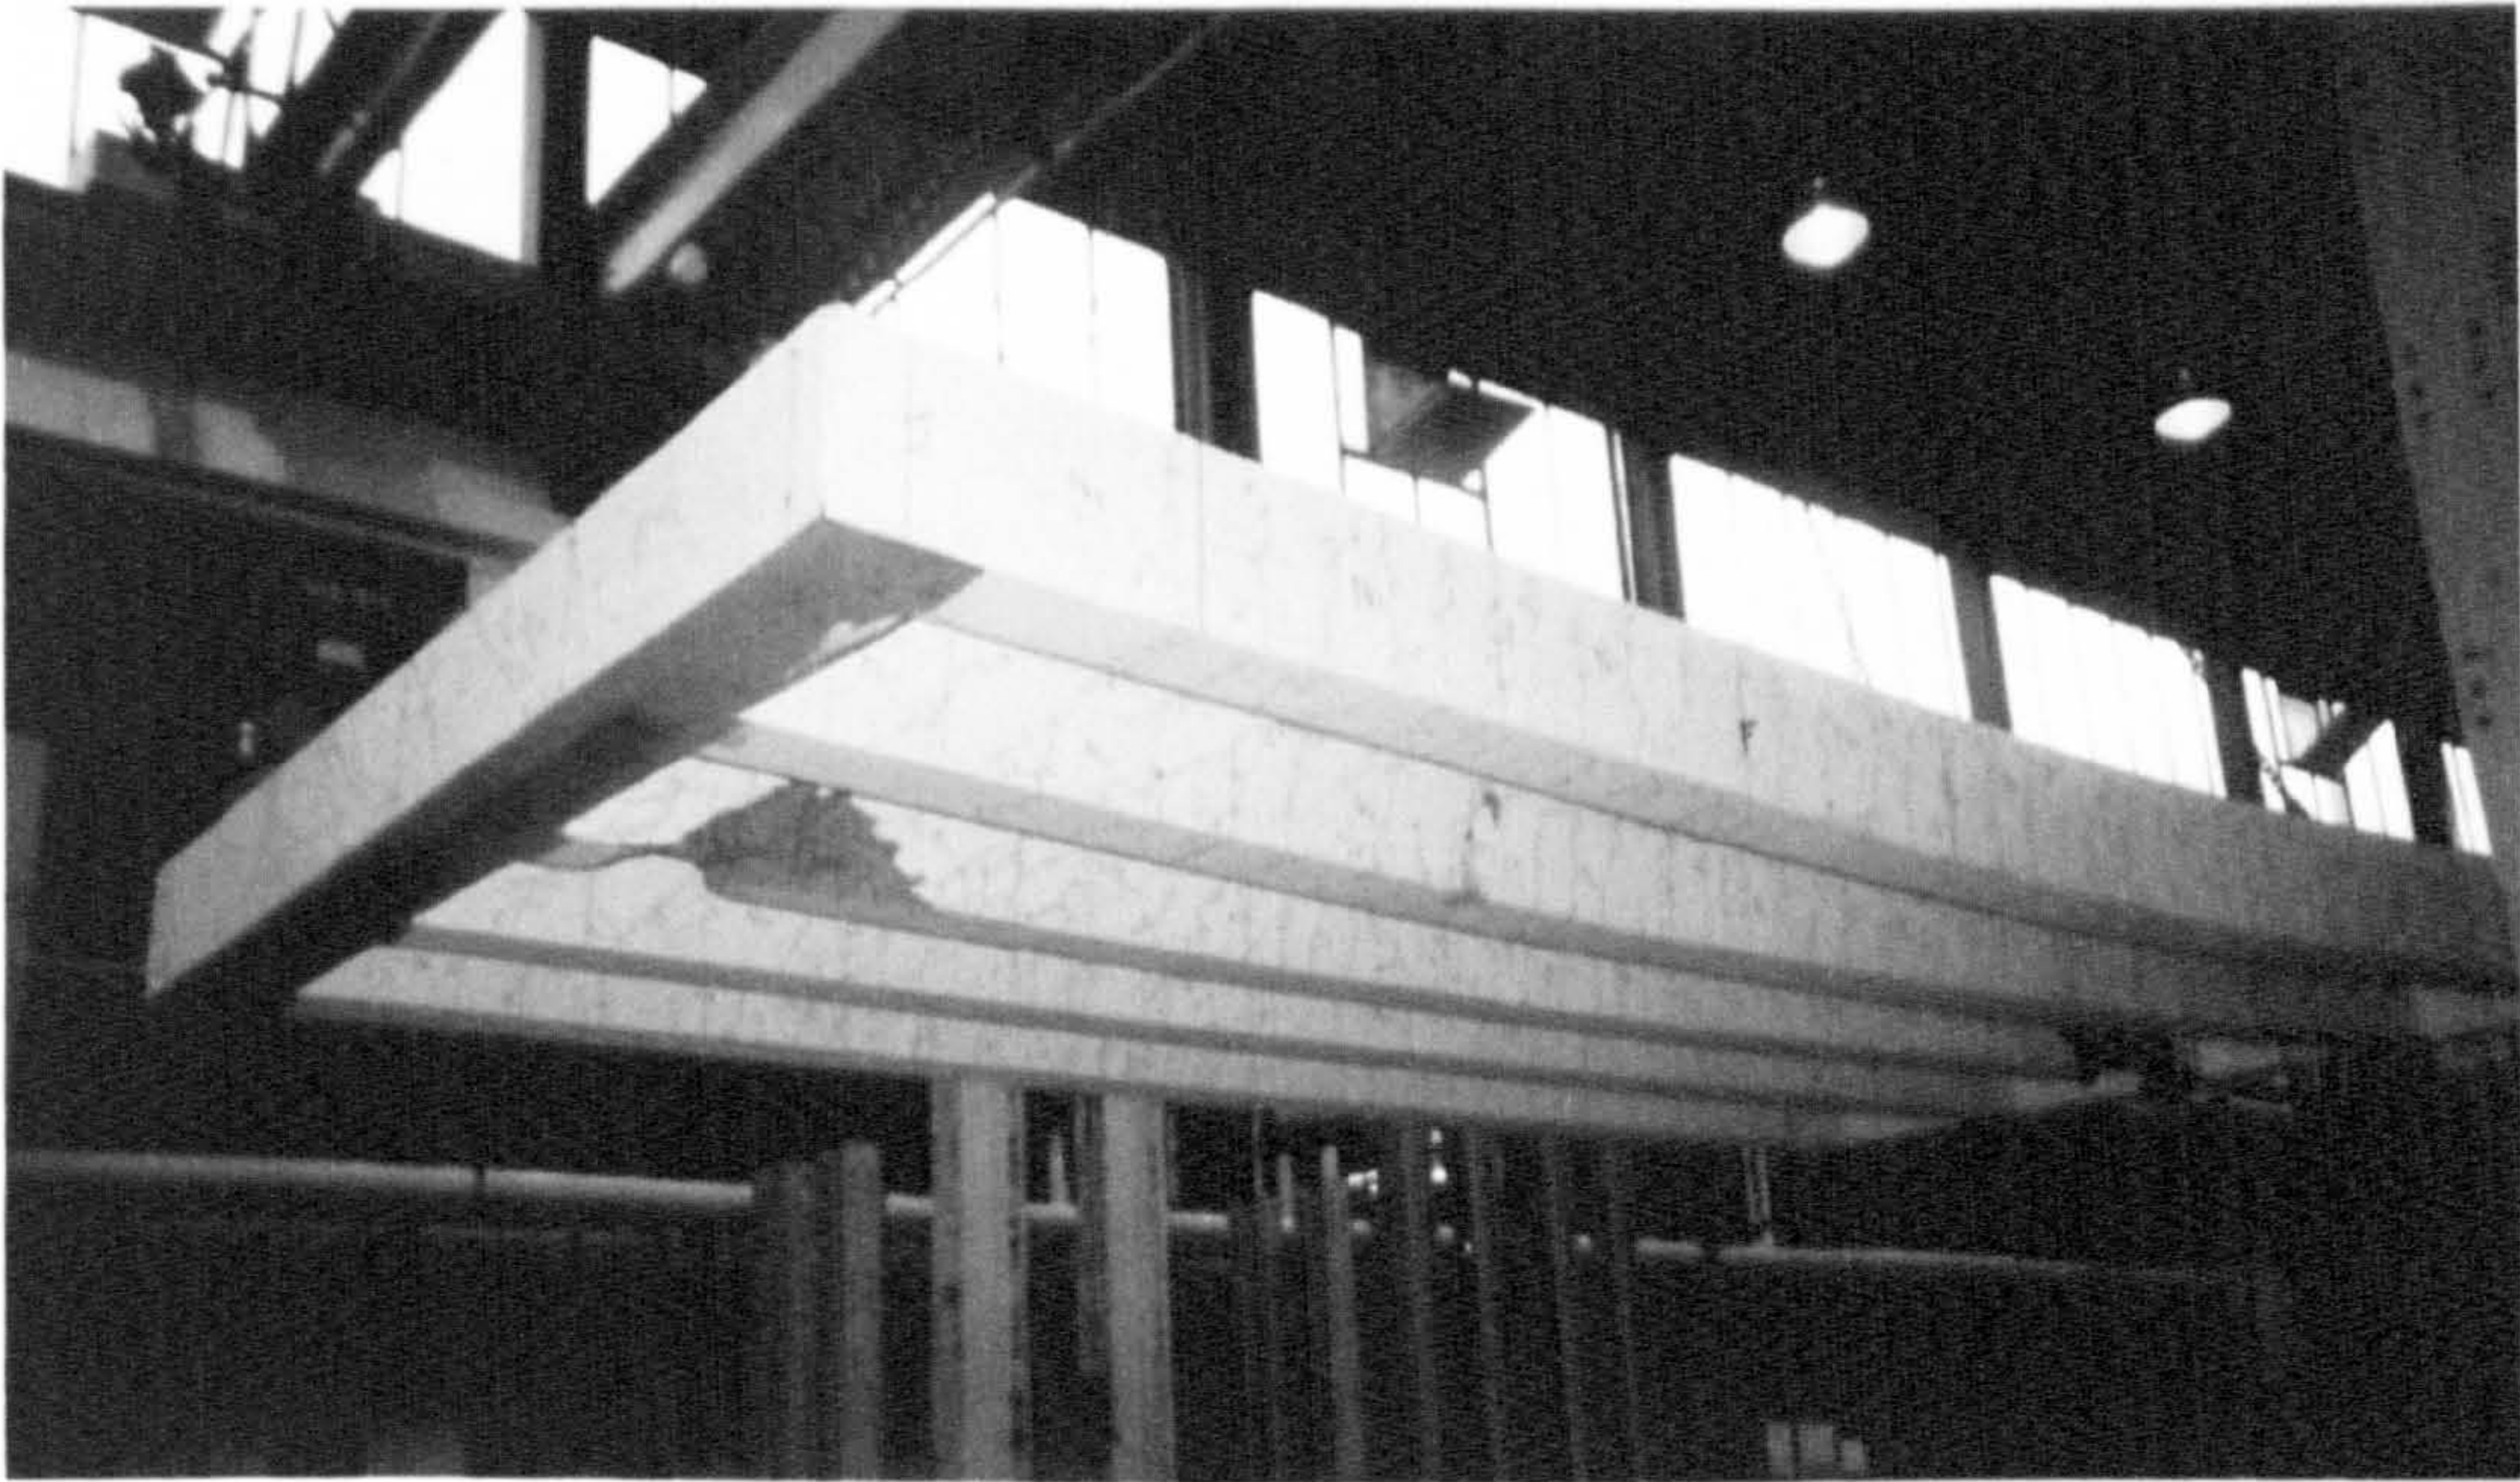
Deck 10 torsion failure at ends of beam iii
